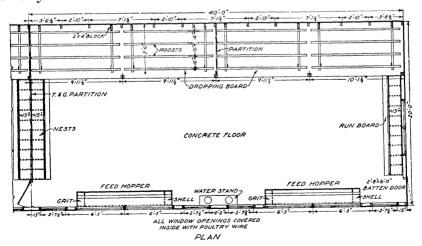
Plan of shed-roof laying house shown in Figure 9. This house is 20 feet wide and can be built any length desired
